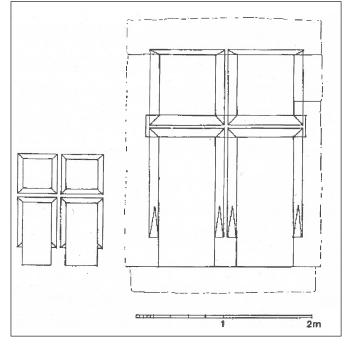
Measurement plan of medieval window frames from the Southern rectangular tower at the town wall of Újlak and the second floor of the castle (Horvat, Zorislav: Analiza srednjovjekovne faze gradnje
